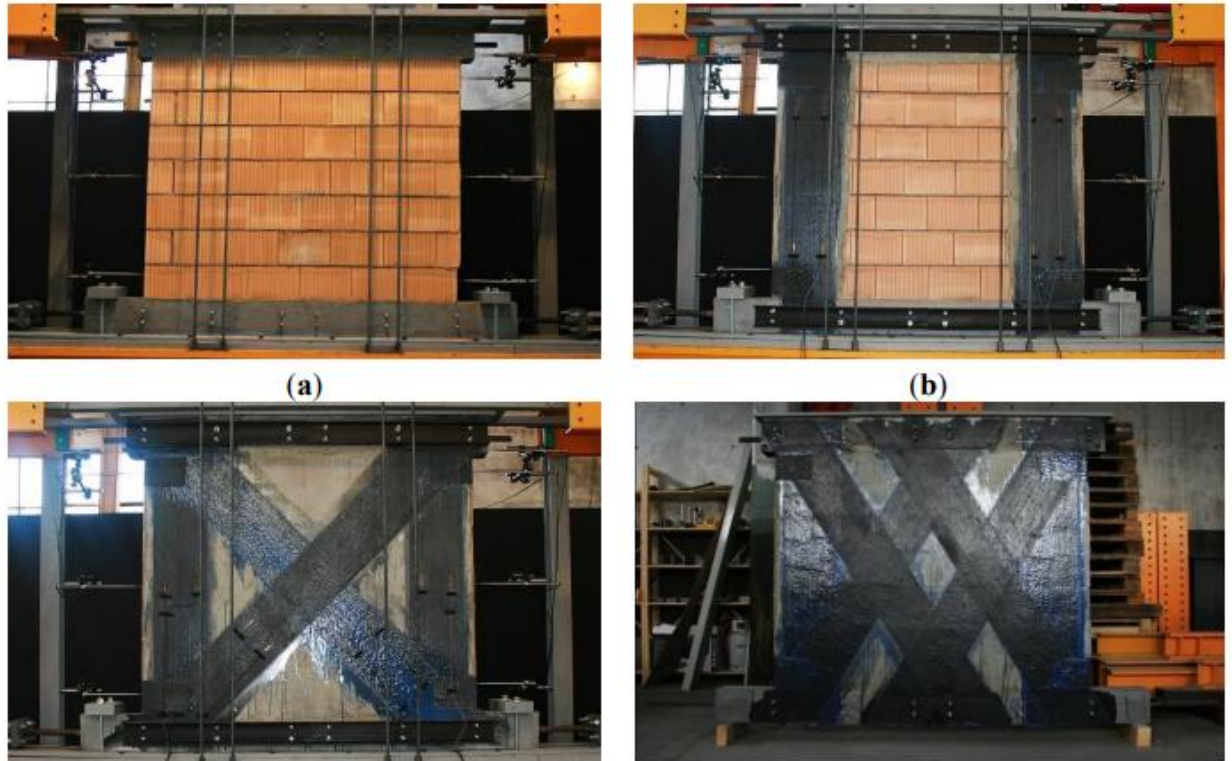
Different configurations of CFRP for retrofitting masonry walls.
